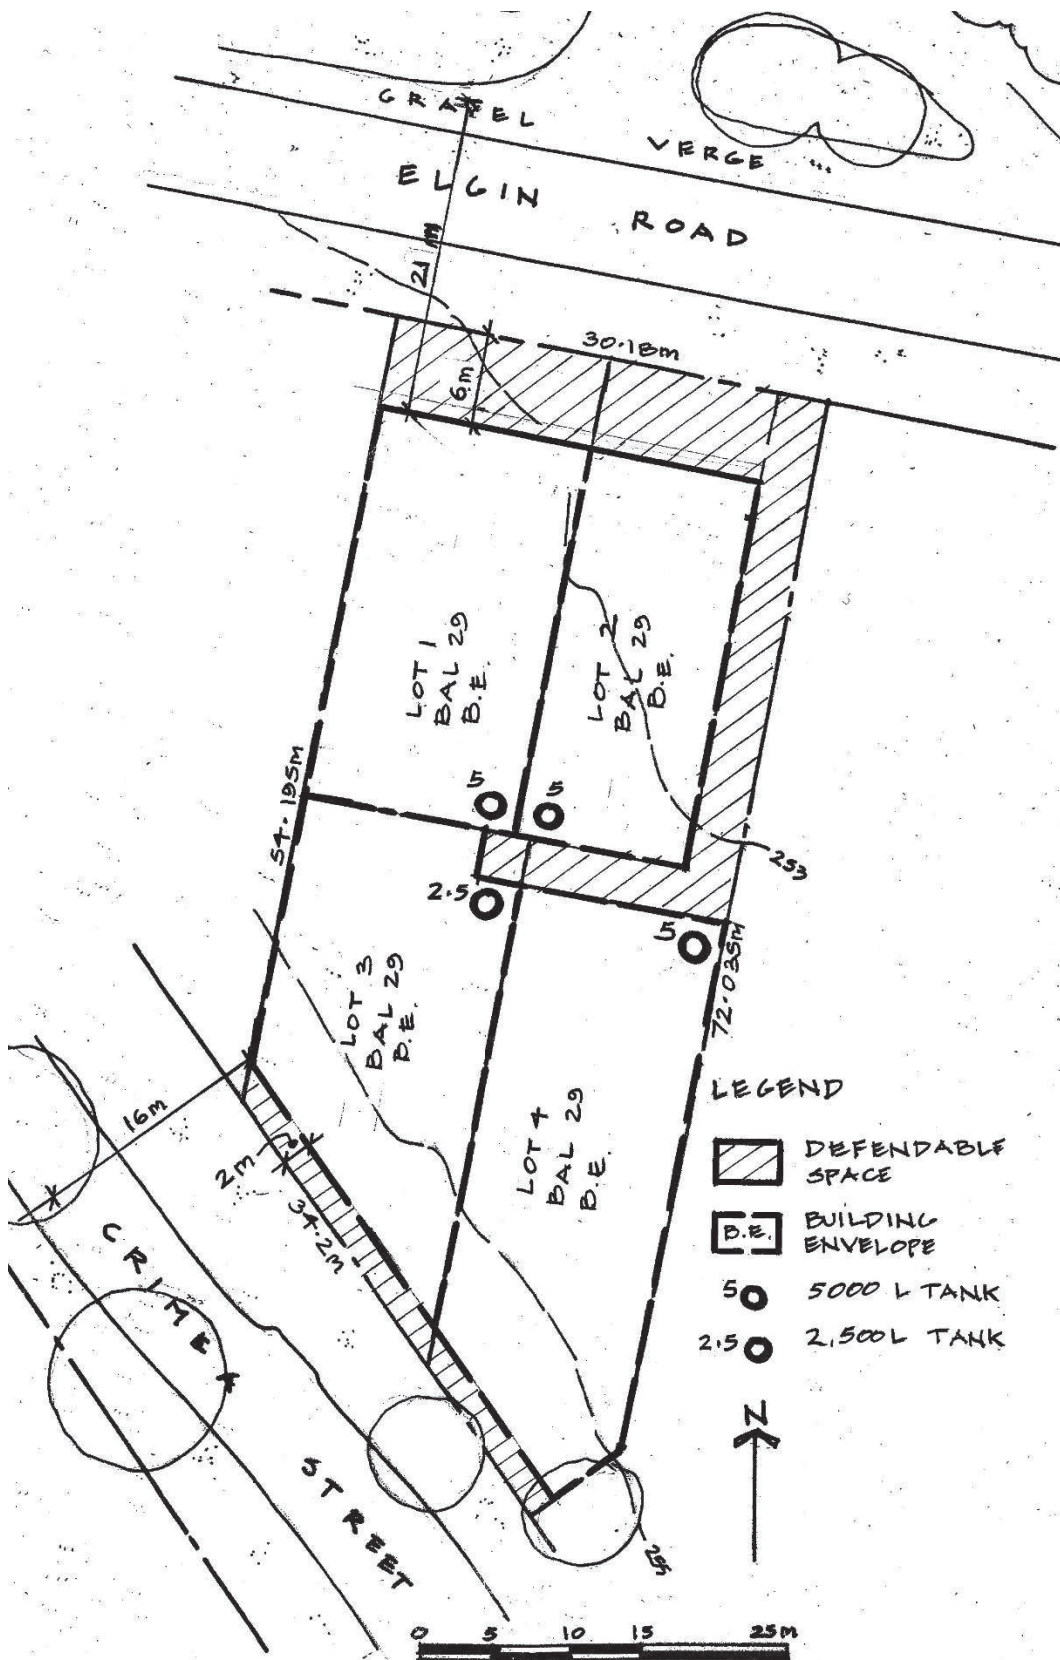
CONSTRUCTION STANDARDS , DEFENDABLE SPACE , ACCESS AND WATER SUPPLY
